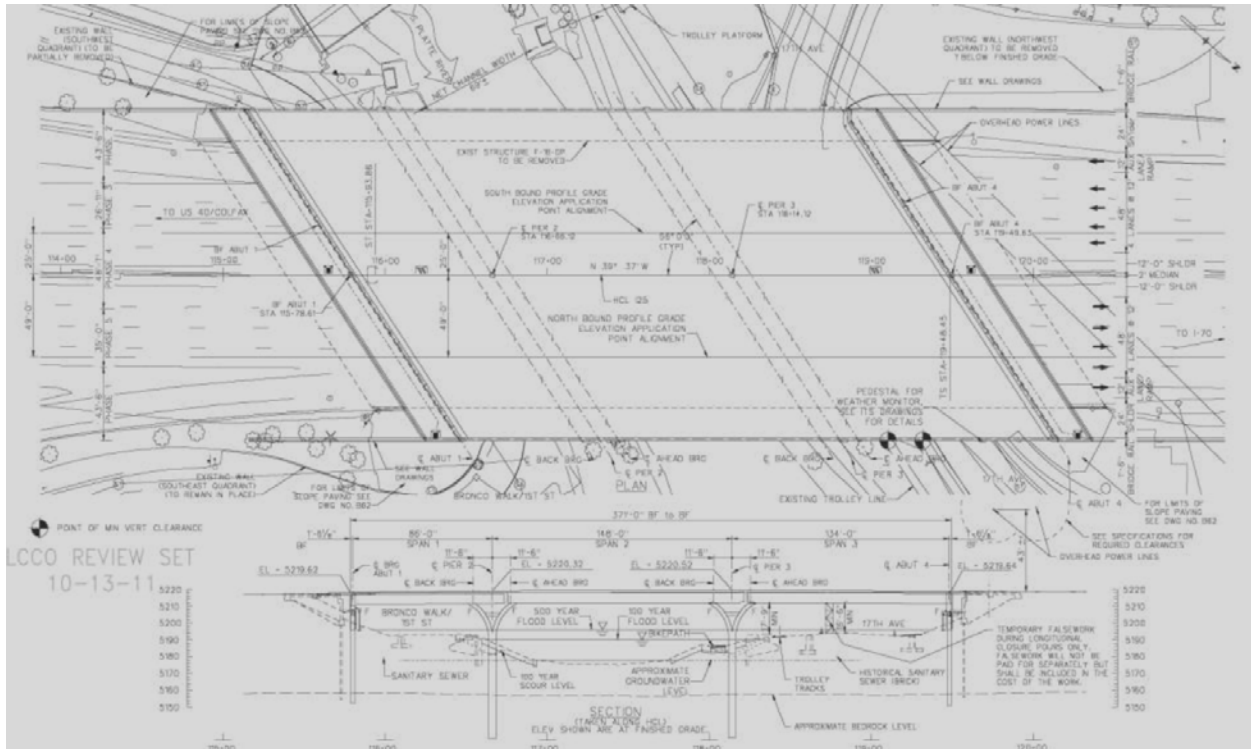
Drawing. Bronco Arch Bridge plan and elevation (courtesy: Colorado DOT).
